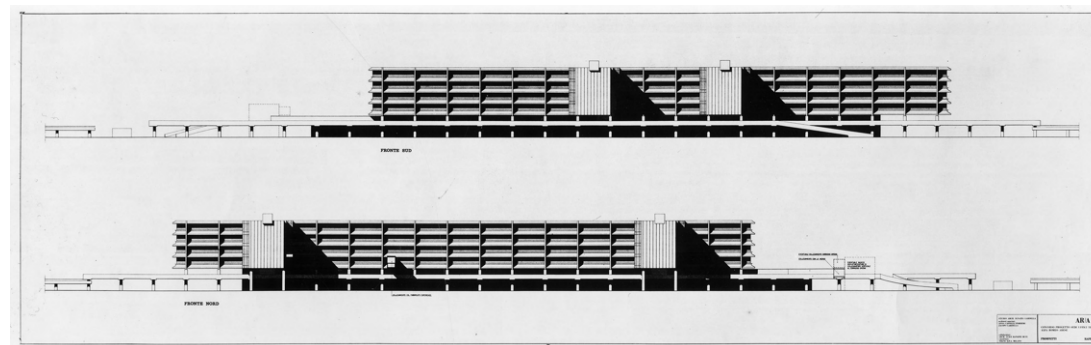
Alfa Romeo Office Building, Arese, 1968-74. Competition plans, elevations, 1967. Gardella Historical Archive, CSAC.
